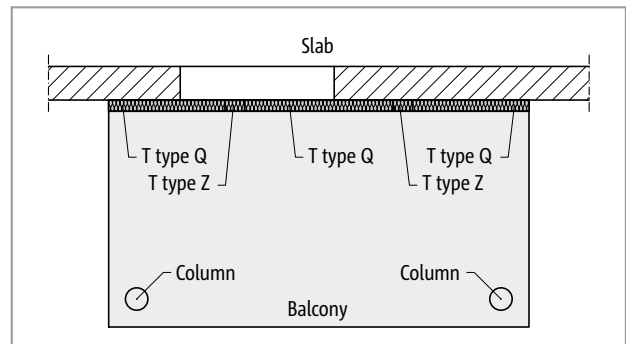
Schöck Isokorb® T type Z, K: Balcony with column support
